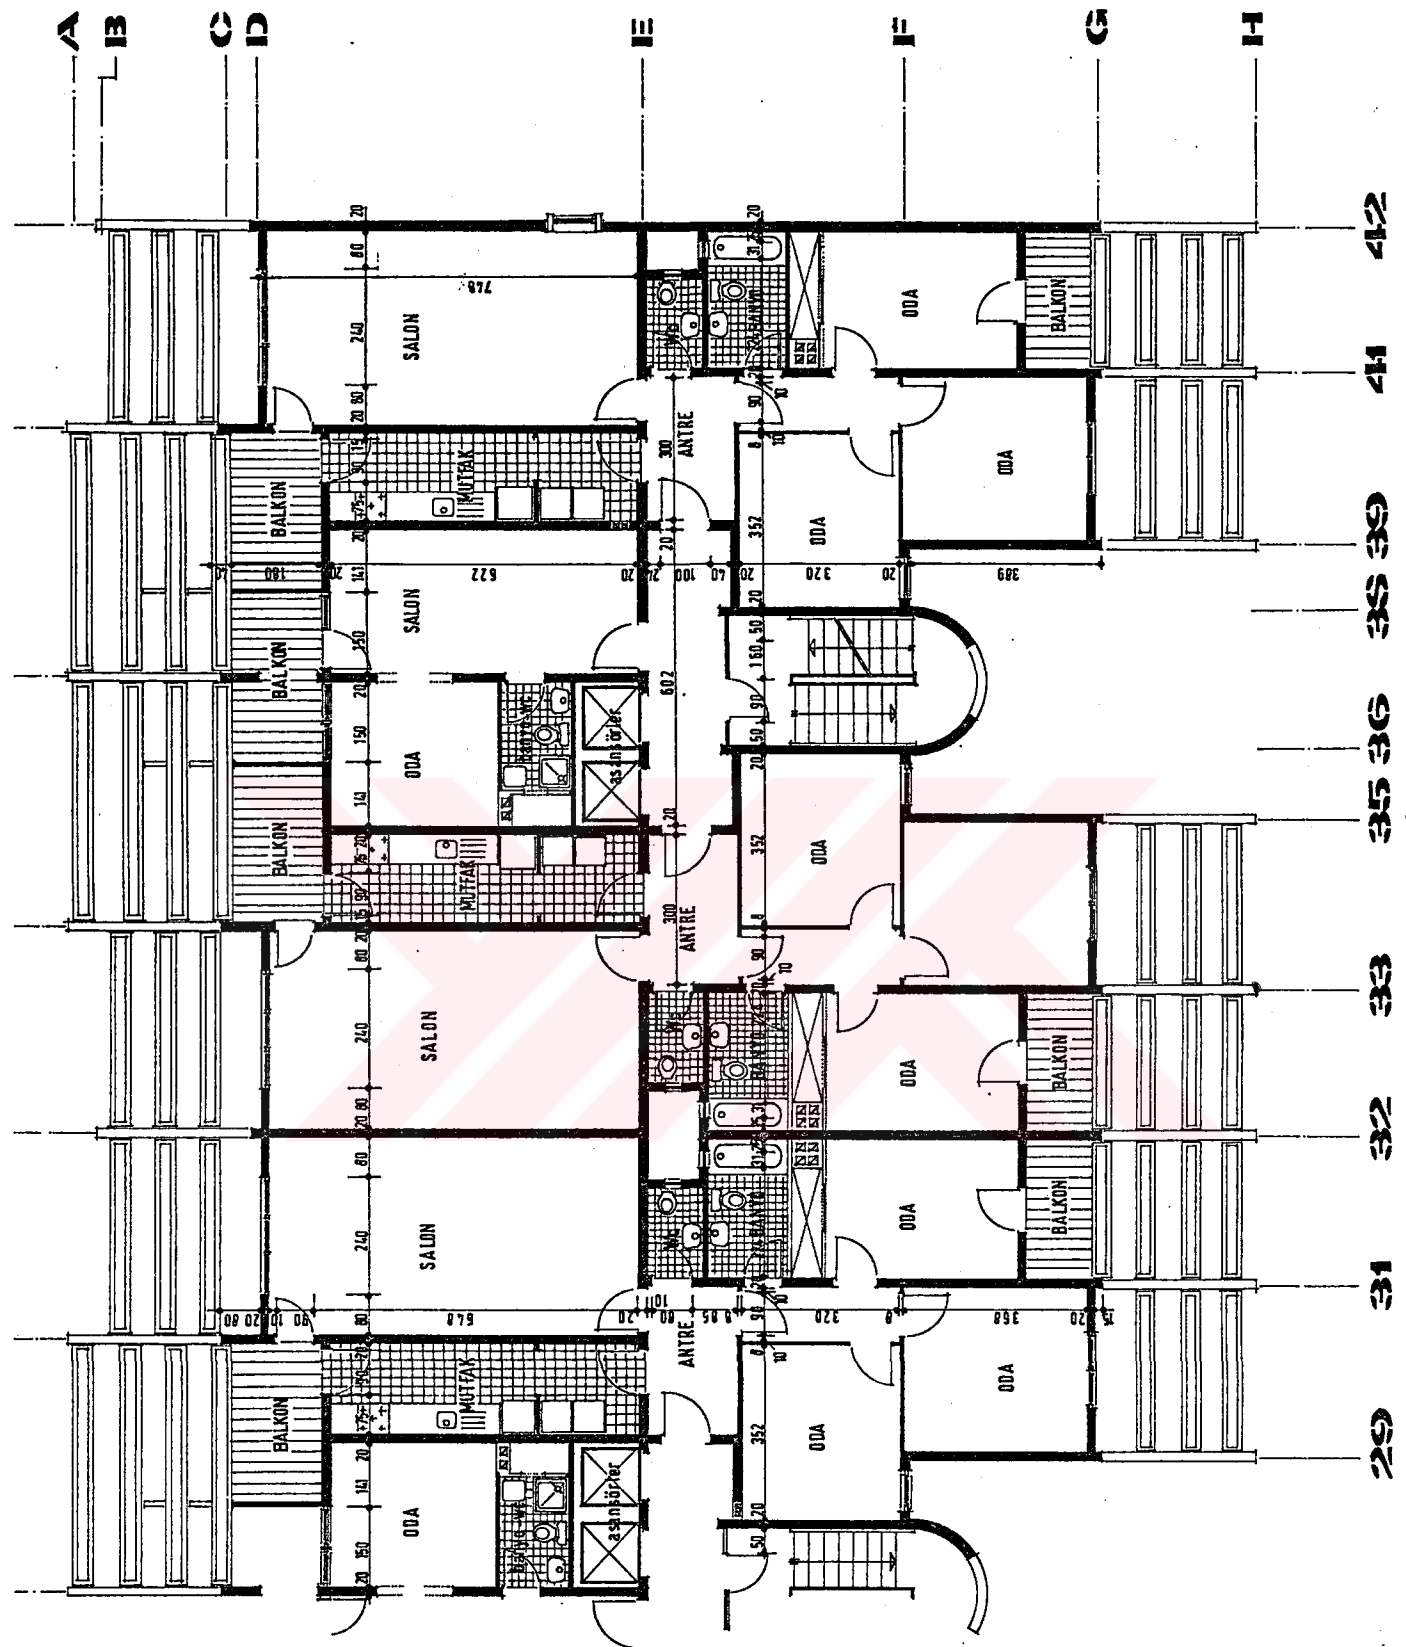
Typical Floor Plan of the Dwellings in Deniz Bostanlığı, Izmir (Scale 1/200)
